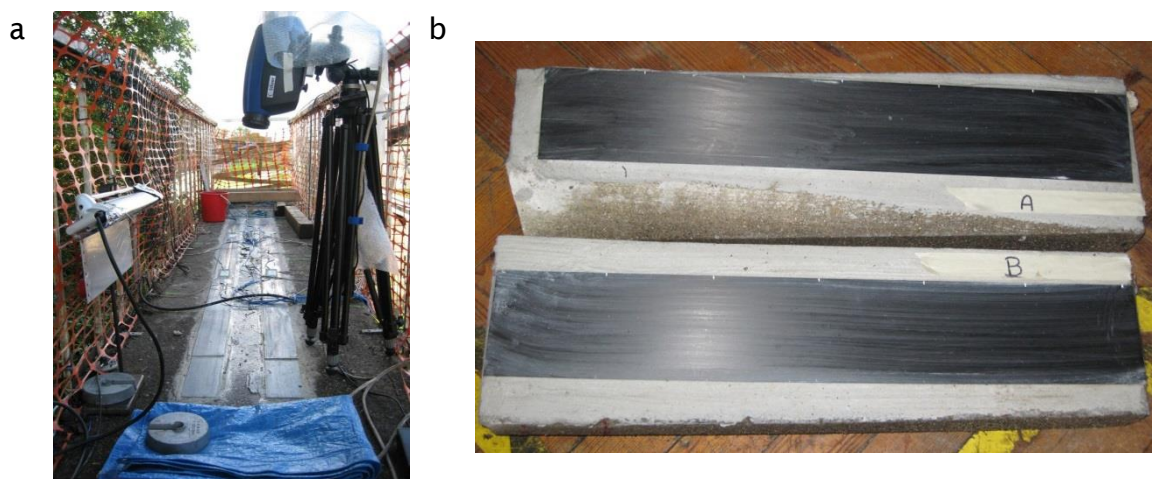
a) CFRP reinforcement installed on bridge with the onsite set up of PPT also shown on the decommissioned bridge and b) samples A and B.
